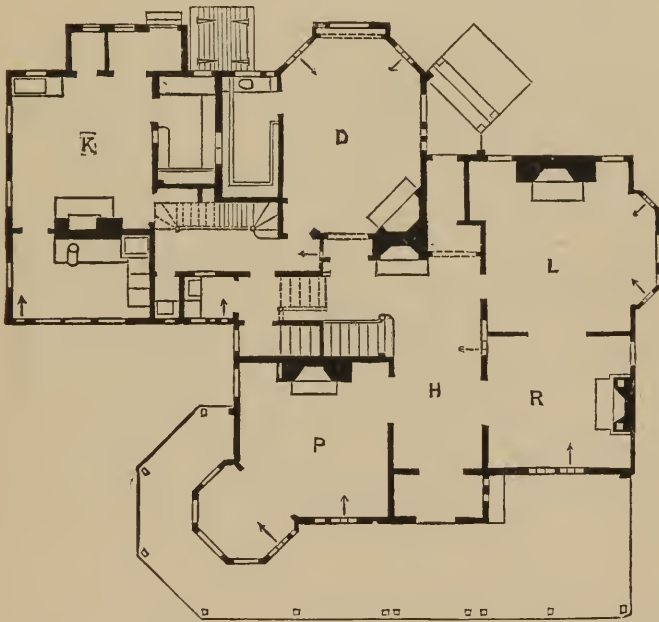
FIRST FLOOR PLAN OF SUBURBAN RESIDENCE.—(See page 64.)
